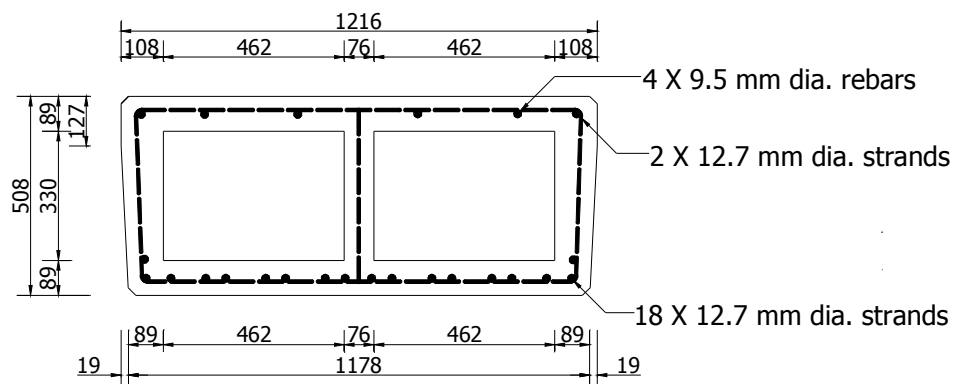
Transverse cross-section of the prestressed concrete girder used for the study. (dimensions in mm)
